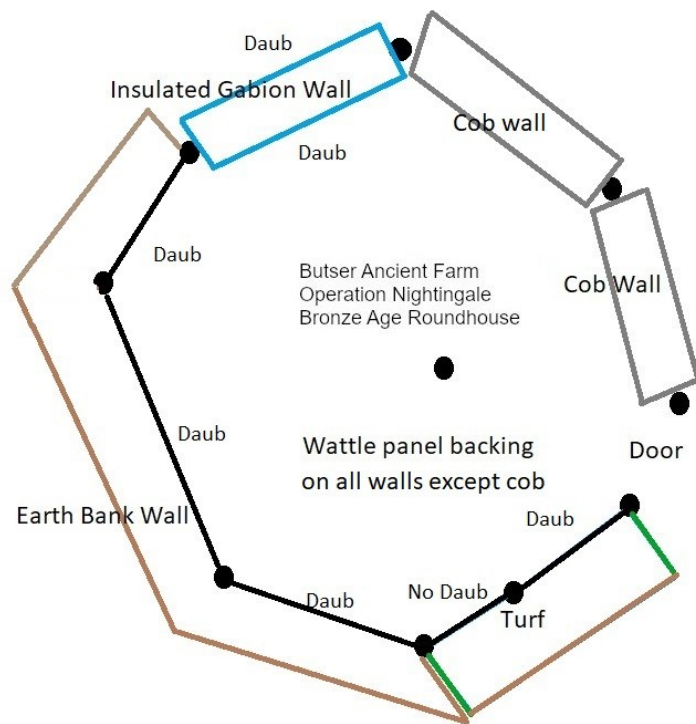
Schematic of wall construction methods (Butser Ancient Farm 2021).
